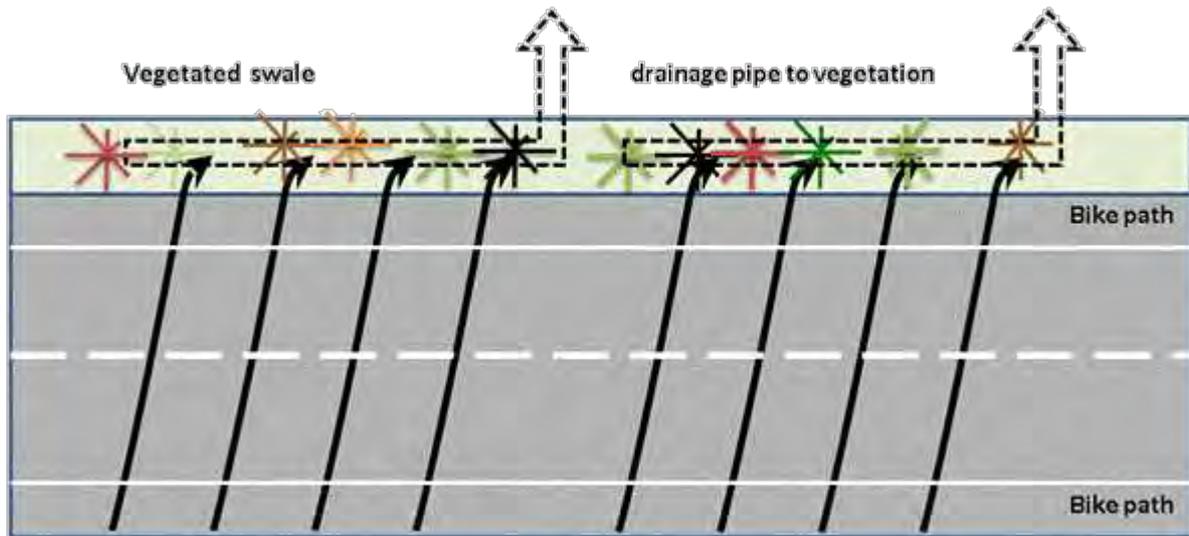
11 Plan of Bioretention Swale runoff and drainage collection pipes.
